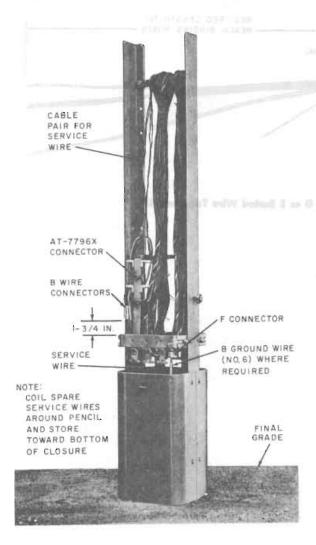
Service Wire Installed—LD-Type Cable Closure (Nonprotected)
